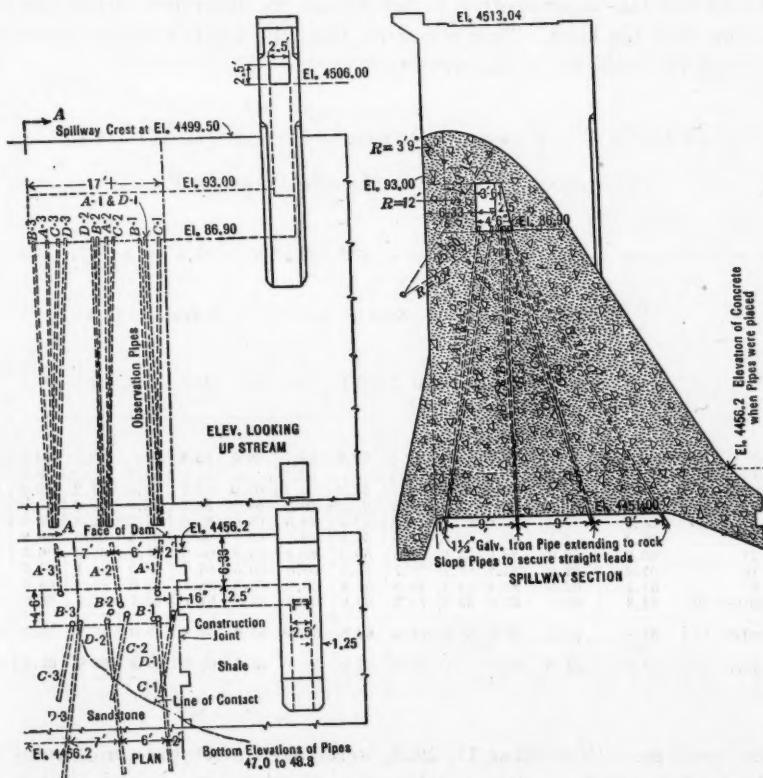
PLAN SHOWING LOCATION OF PRESSURE PIPES, WILLWOOD DIVERSION DAM.
